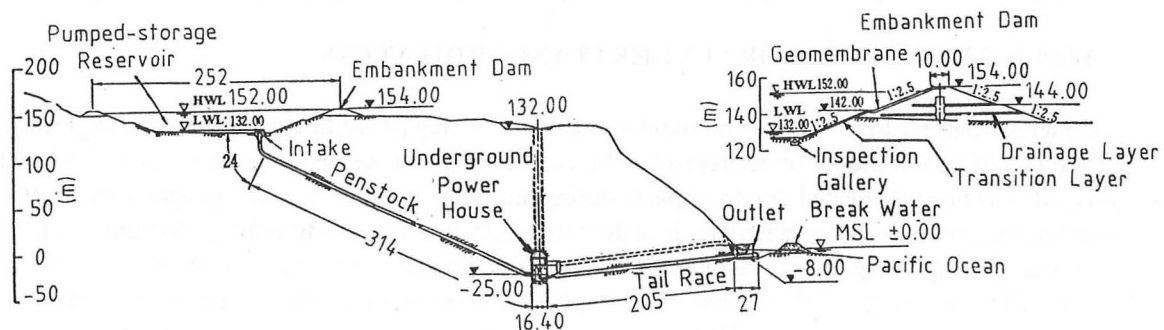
Cross-Section of the Sea Water Pumped-Storage Power Plant (Ref. 4).
